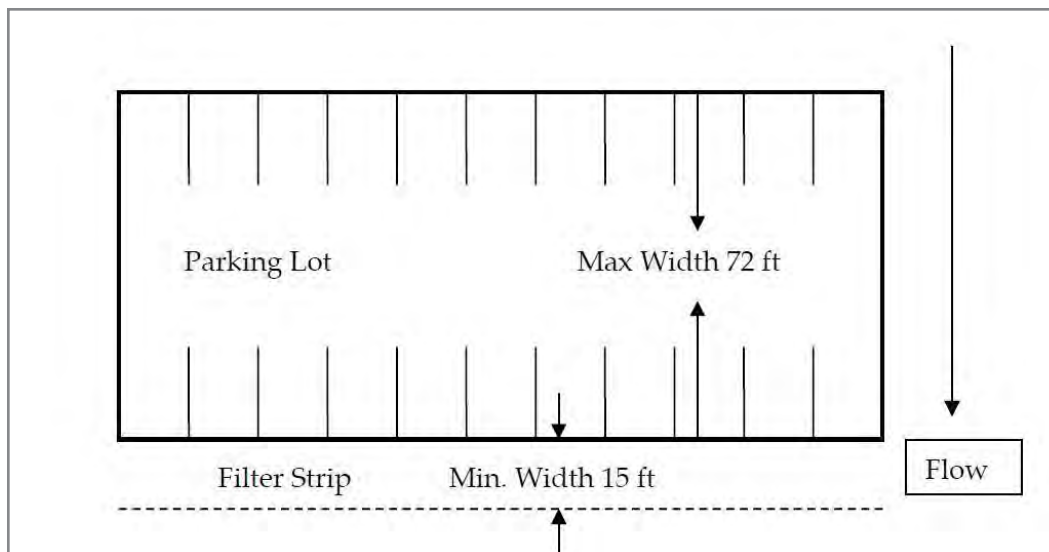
Example configuration of filter strip adjacent to a parking lot.
